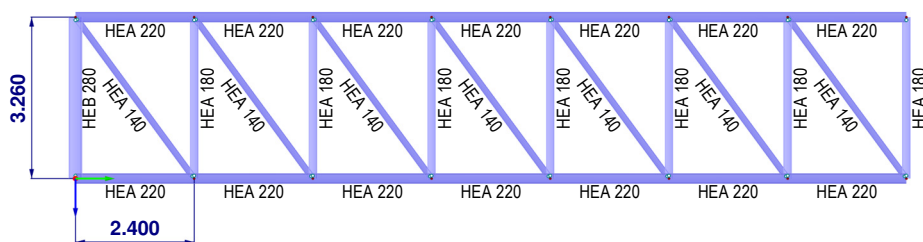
Dimensions of the truss and cross-sections of members in the analysed truss element
